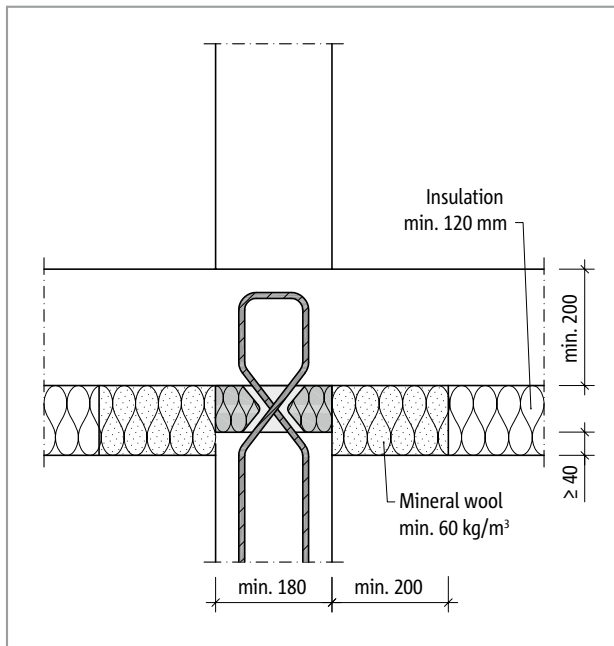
Schöck Sconnex® type W: R 120 / EI 120 with internal wall and under-slab insulation
